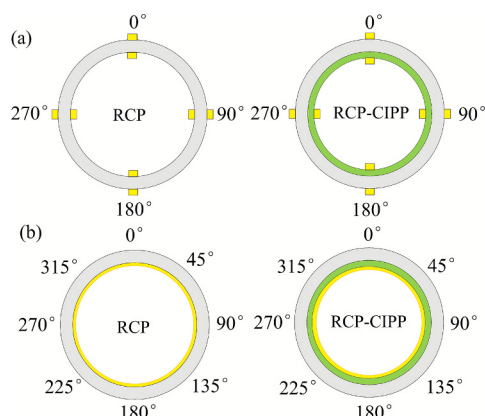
Strain gauge arrangement:(a) Strain gauge layout, and (b) Fiber optic cable layout diagram.
